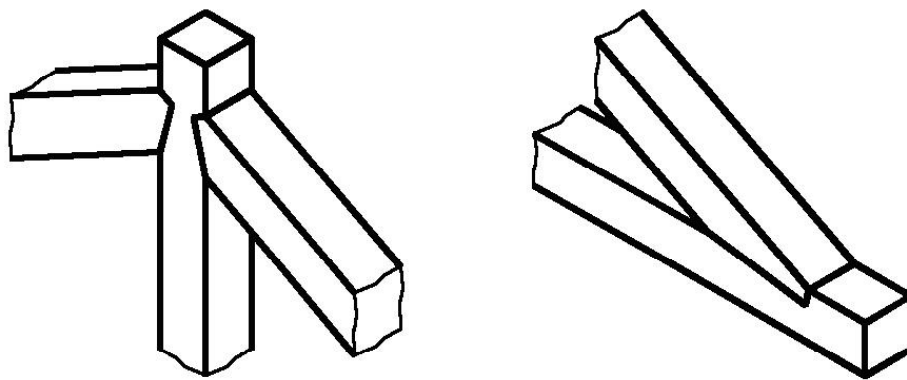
Typical locations of the birdsmouth joint in a timber roof truss
